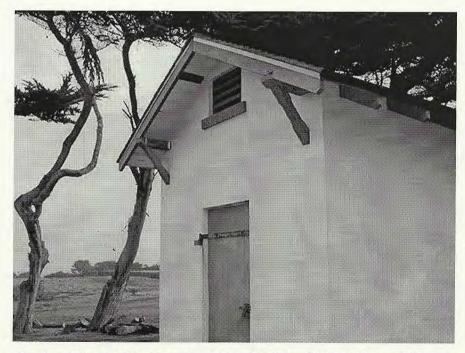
shows the exterior of the oil building with some rust on the doorframe and dry rot in the eves.
